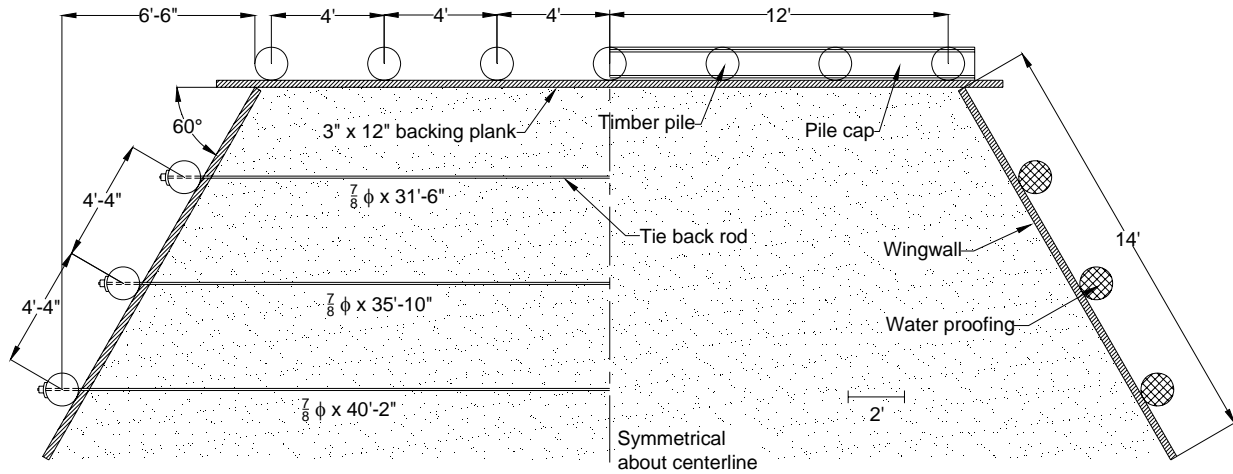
Plan view of bridge abutment (Bridge No. 029070 – Humboldt County)
